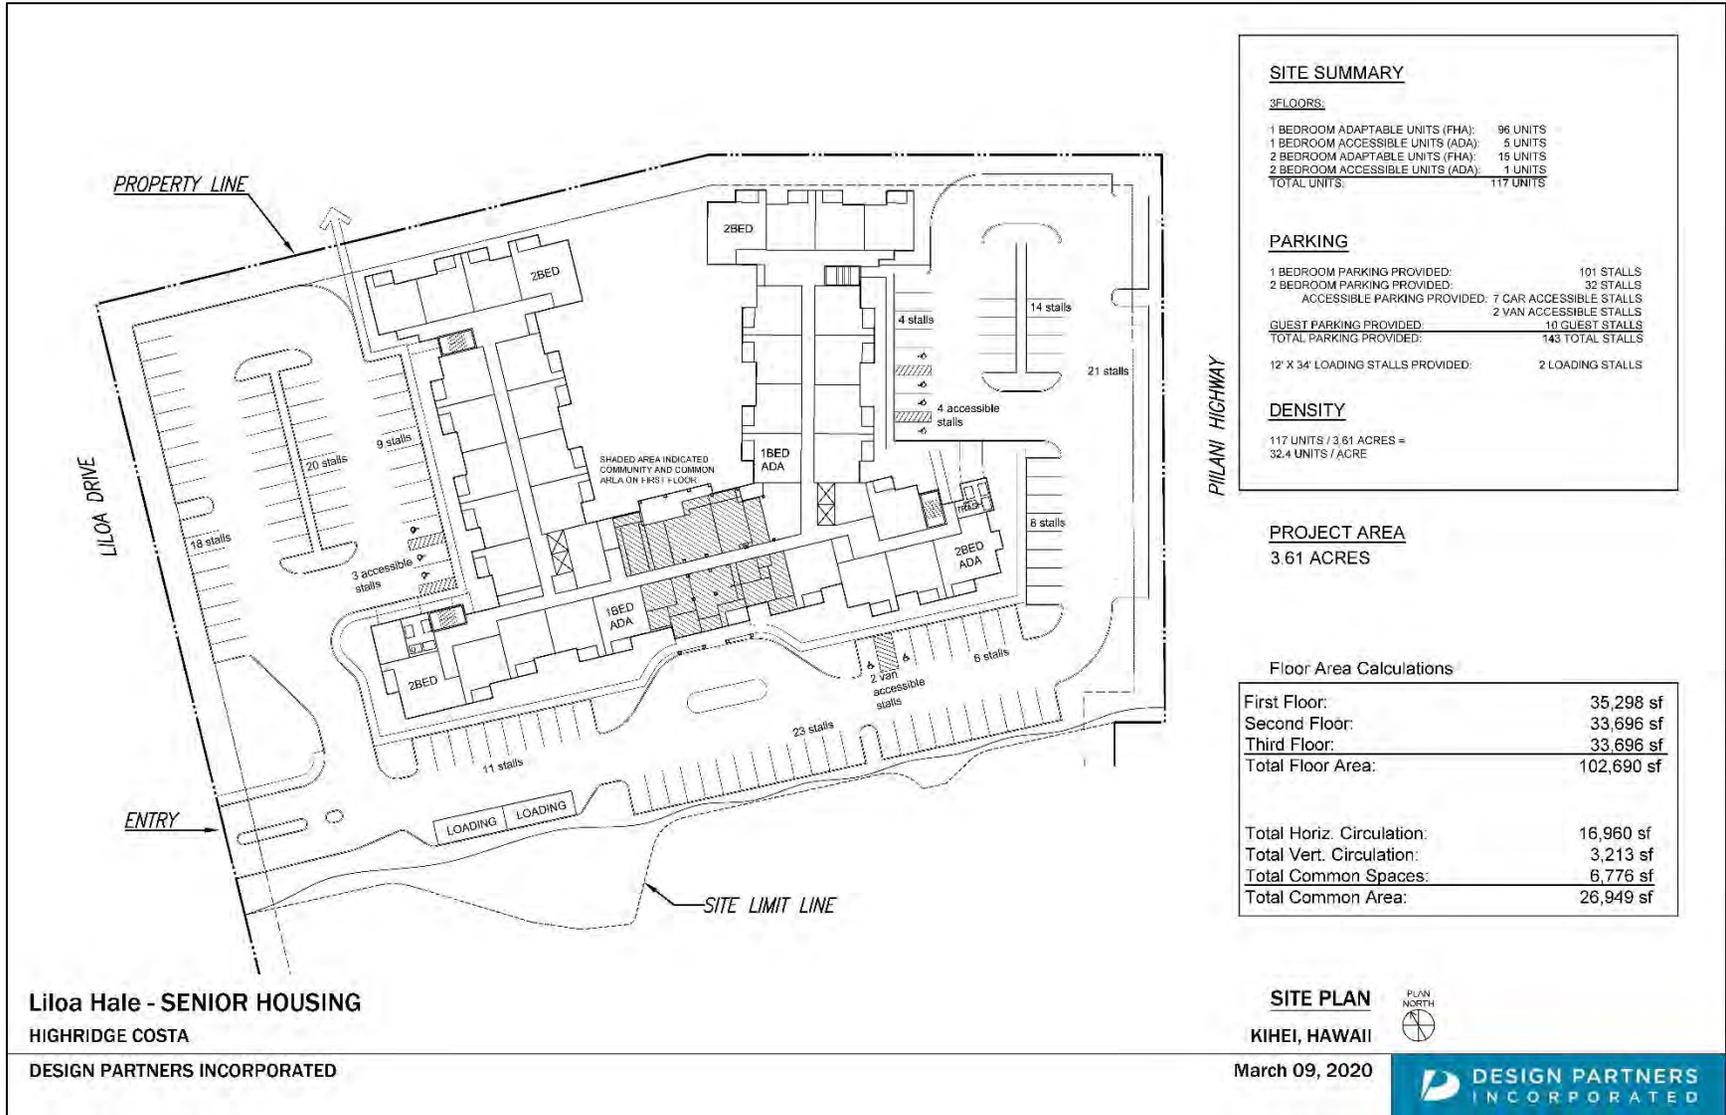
Proposed Residential and Parking Plan (courtesy of Liloa Senior Housing, LP.)
